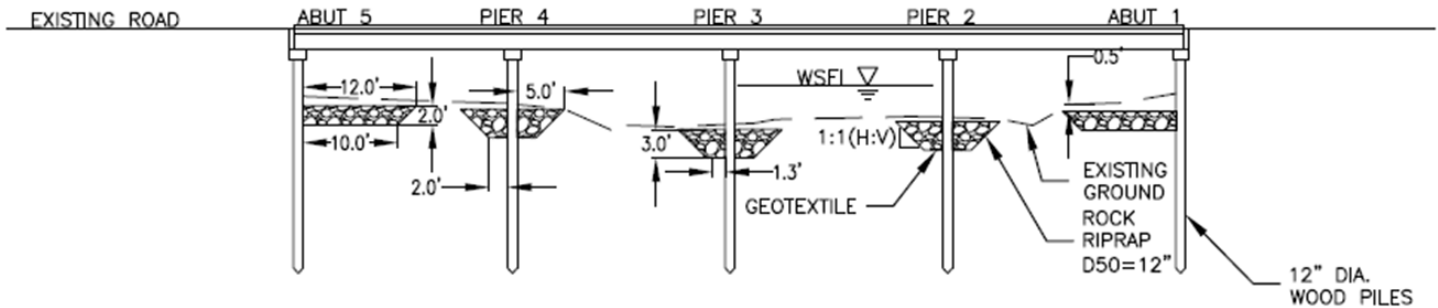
Cross-sectional view of Bridge H-13-R with recommended hydraulic scour countermeasures
